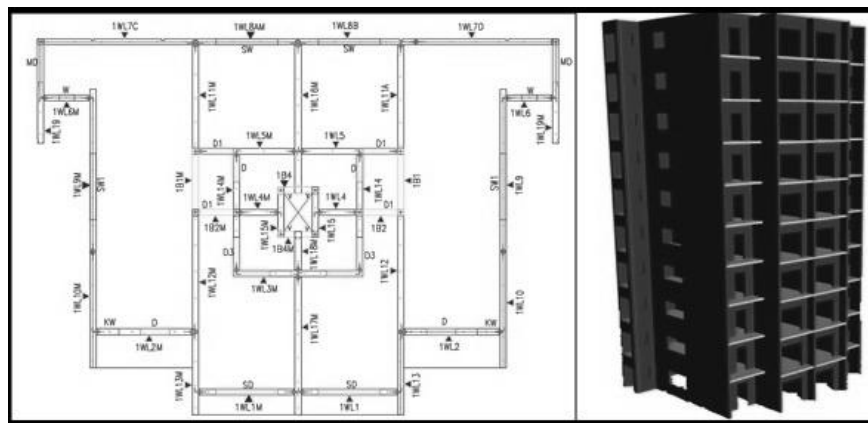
Precast Building (a) Plan and (b) 3D View in ETABS
